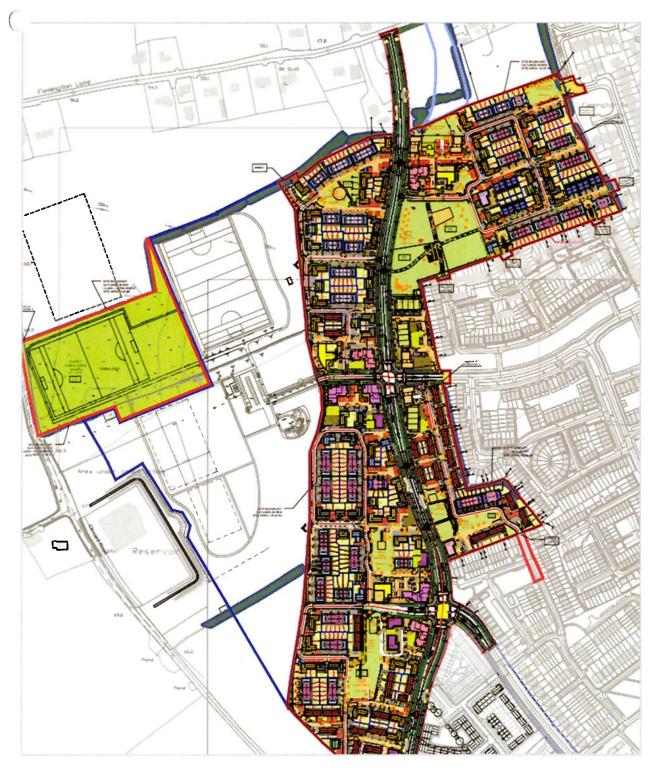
Extract from the Site Layout Plan as submitted at Further Information Stage under Red. Ref. LRD0006/S3
